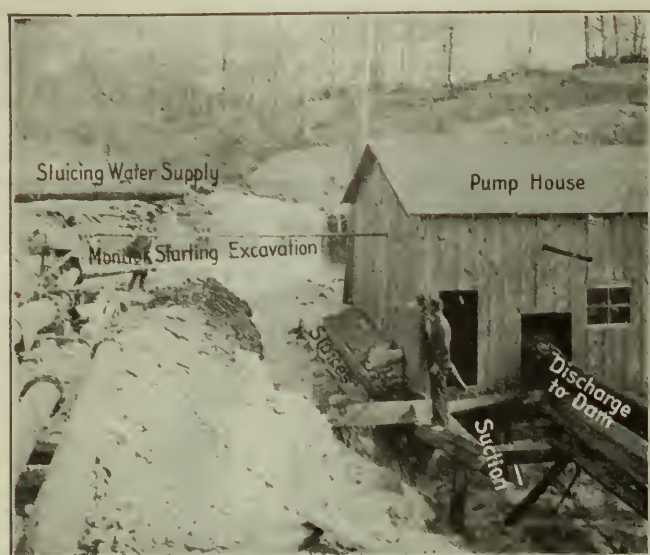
START OF HYDRAULIC EXCAVATION AT TAYLORSVILLE BORROW PIT
